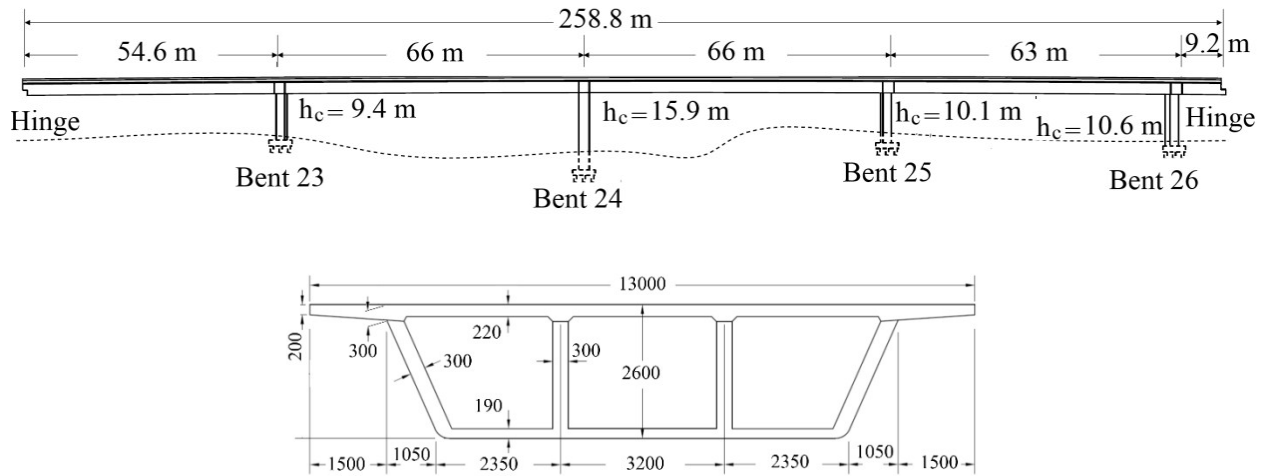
Elevation view and cross sectional view (mm) of Frame 6
